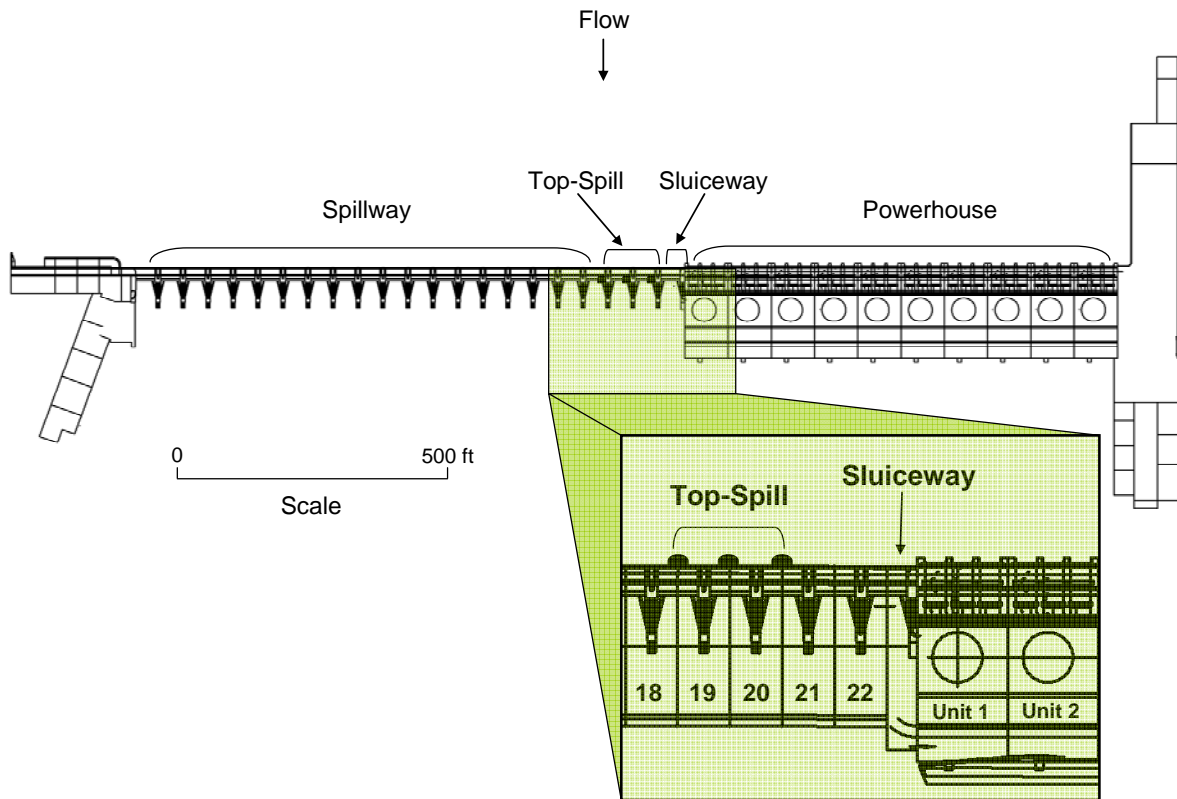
Plan view of Priest Rapids Dam. The prototype top-spill bulkhead at Priest Rapids Dam located at Spill Bay 19 and 20. The sluiceway is located between the junction of Turbine Unit 1 and the spillway.
